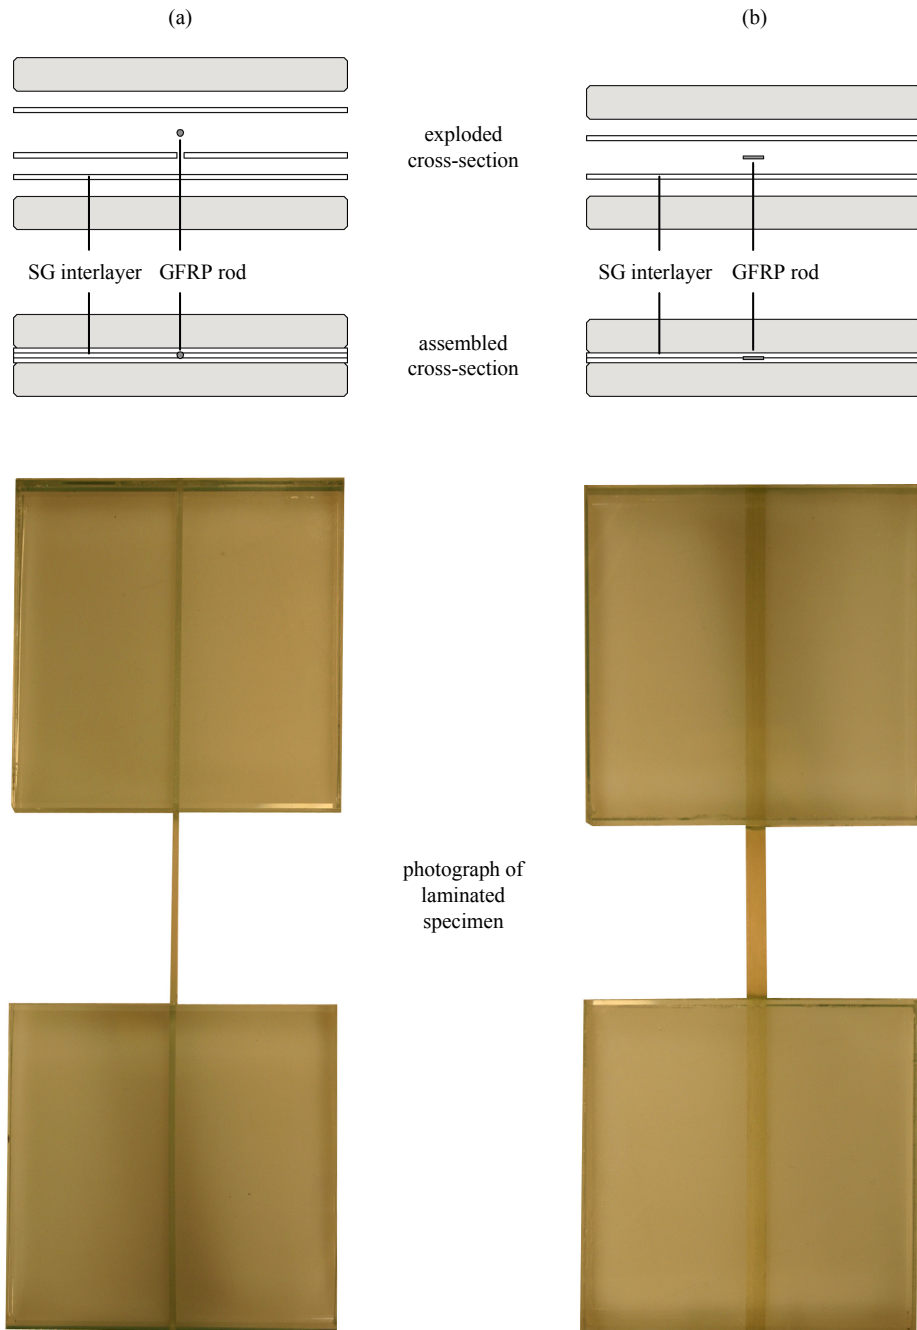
Exploded cross-section, assembled cross-section and photograph of the GFRP pull-out specimens; (a) Pull-out specimens with the round GFRP rods; (b) Pull-out specimens with flat GFRP rods.
